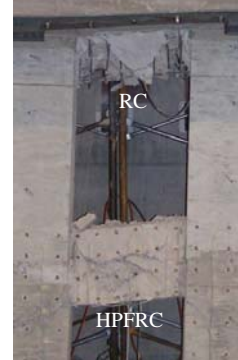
Damage in coupling beams (RC on top, HPFRC on bottom)
